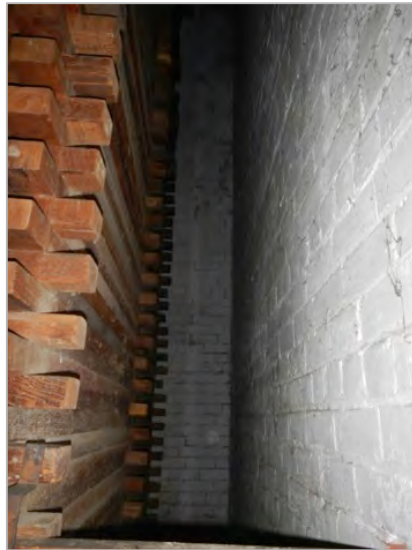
Mill building—second floor timber silos (© Kasiannan, 2015)
